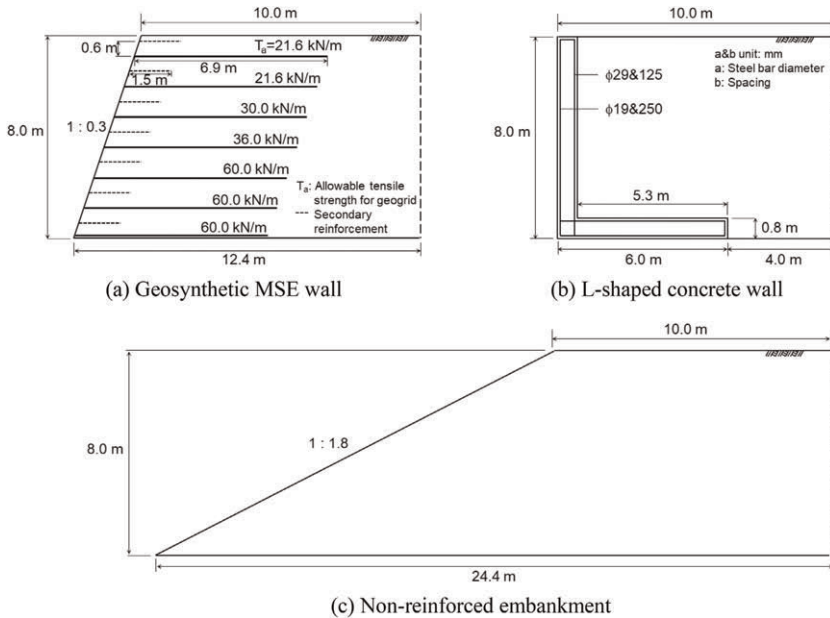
Typical cross-sections of geosynthetic MSE wall, L-shaped concrete wall, and non-reinforced embankment.
